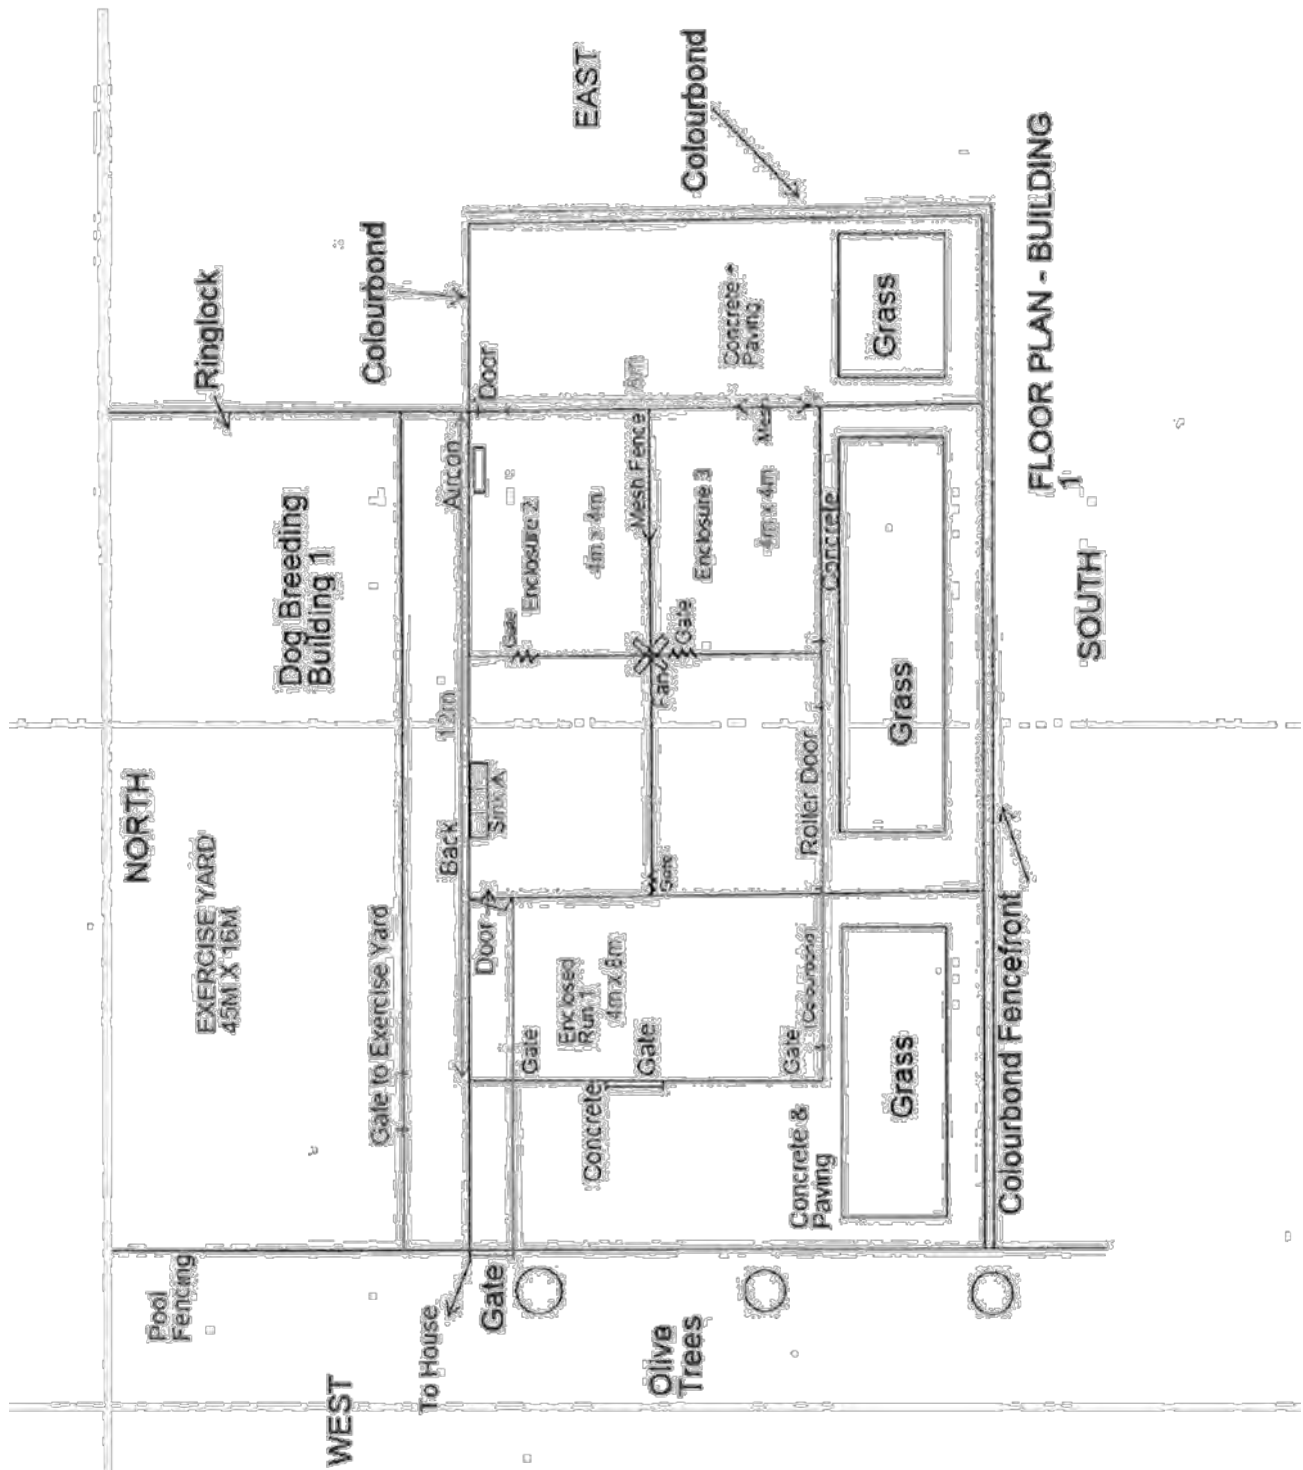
Floor Plan of Building 1 (Source – Applicant)
